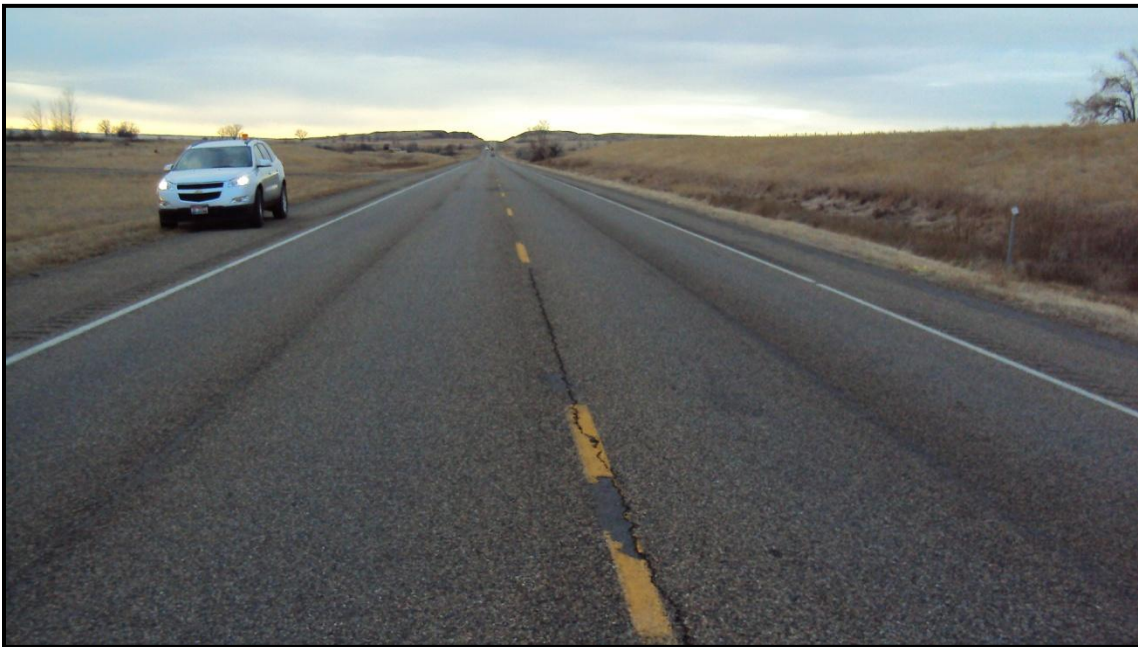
Looking across MT 16 at continuous transverse pavement cracking. Pavement cracking within the travel way measured approximately 0.5 inches in width, approximately every 35 feet. RP 29.0.
